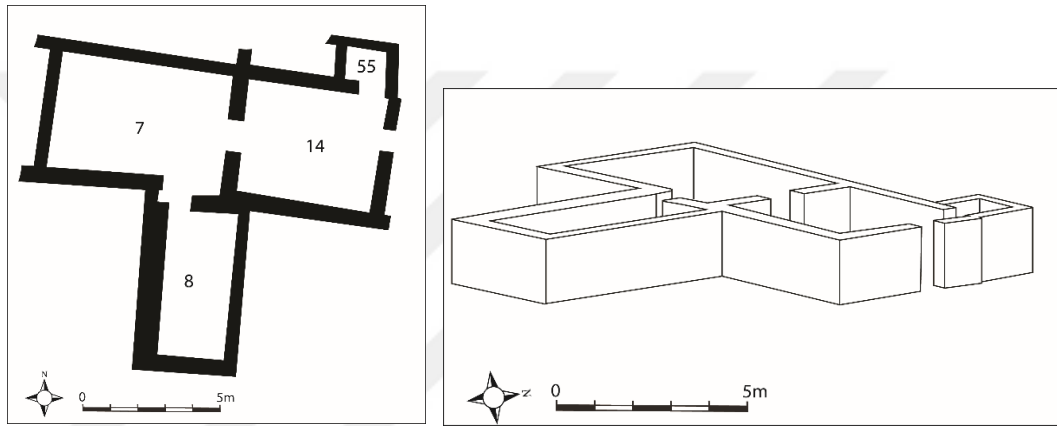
House 1 plan (Illustrated by M.Çarkı)
